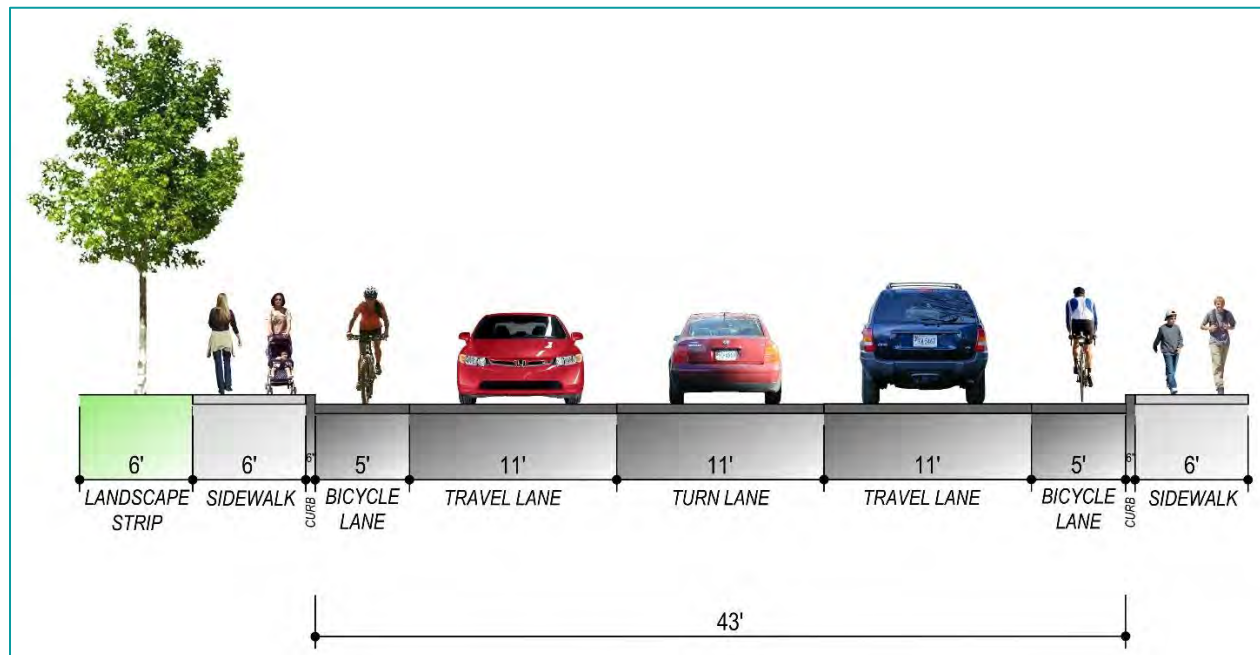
Preferred Alternative: Section C – 9th Street between E. Market Street and E. Jefferson Street
